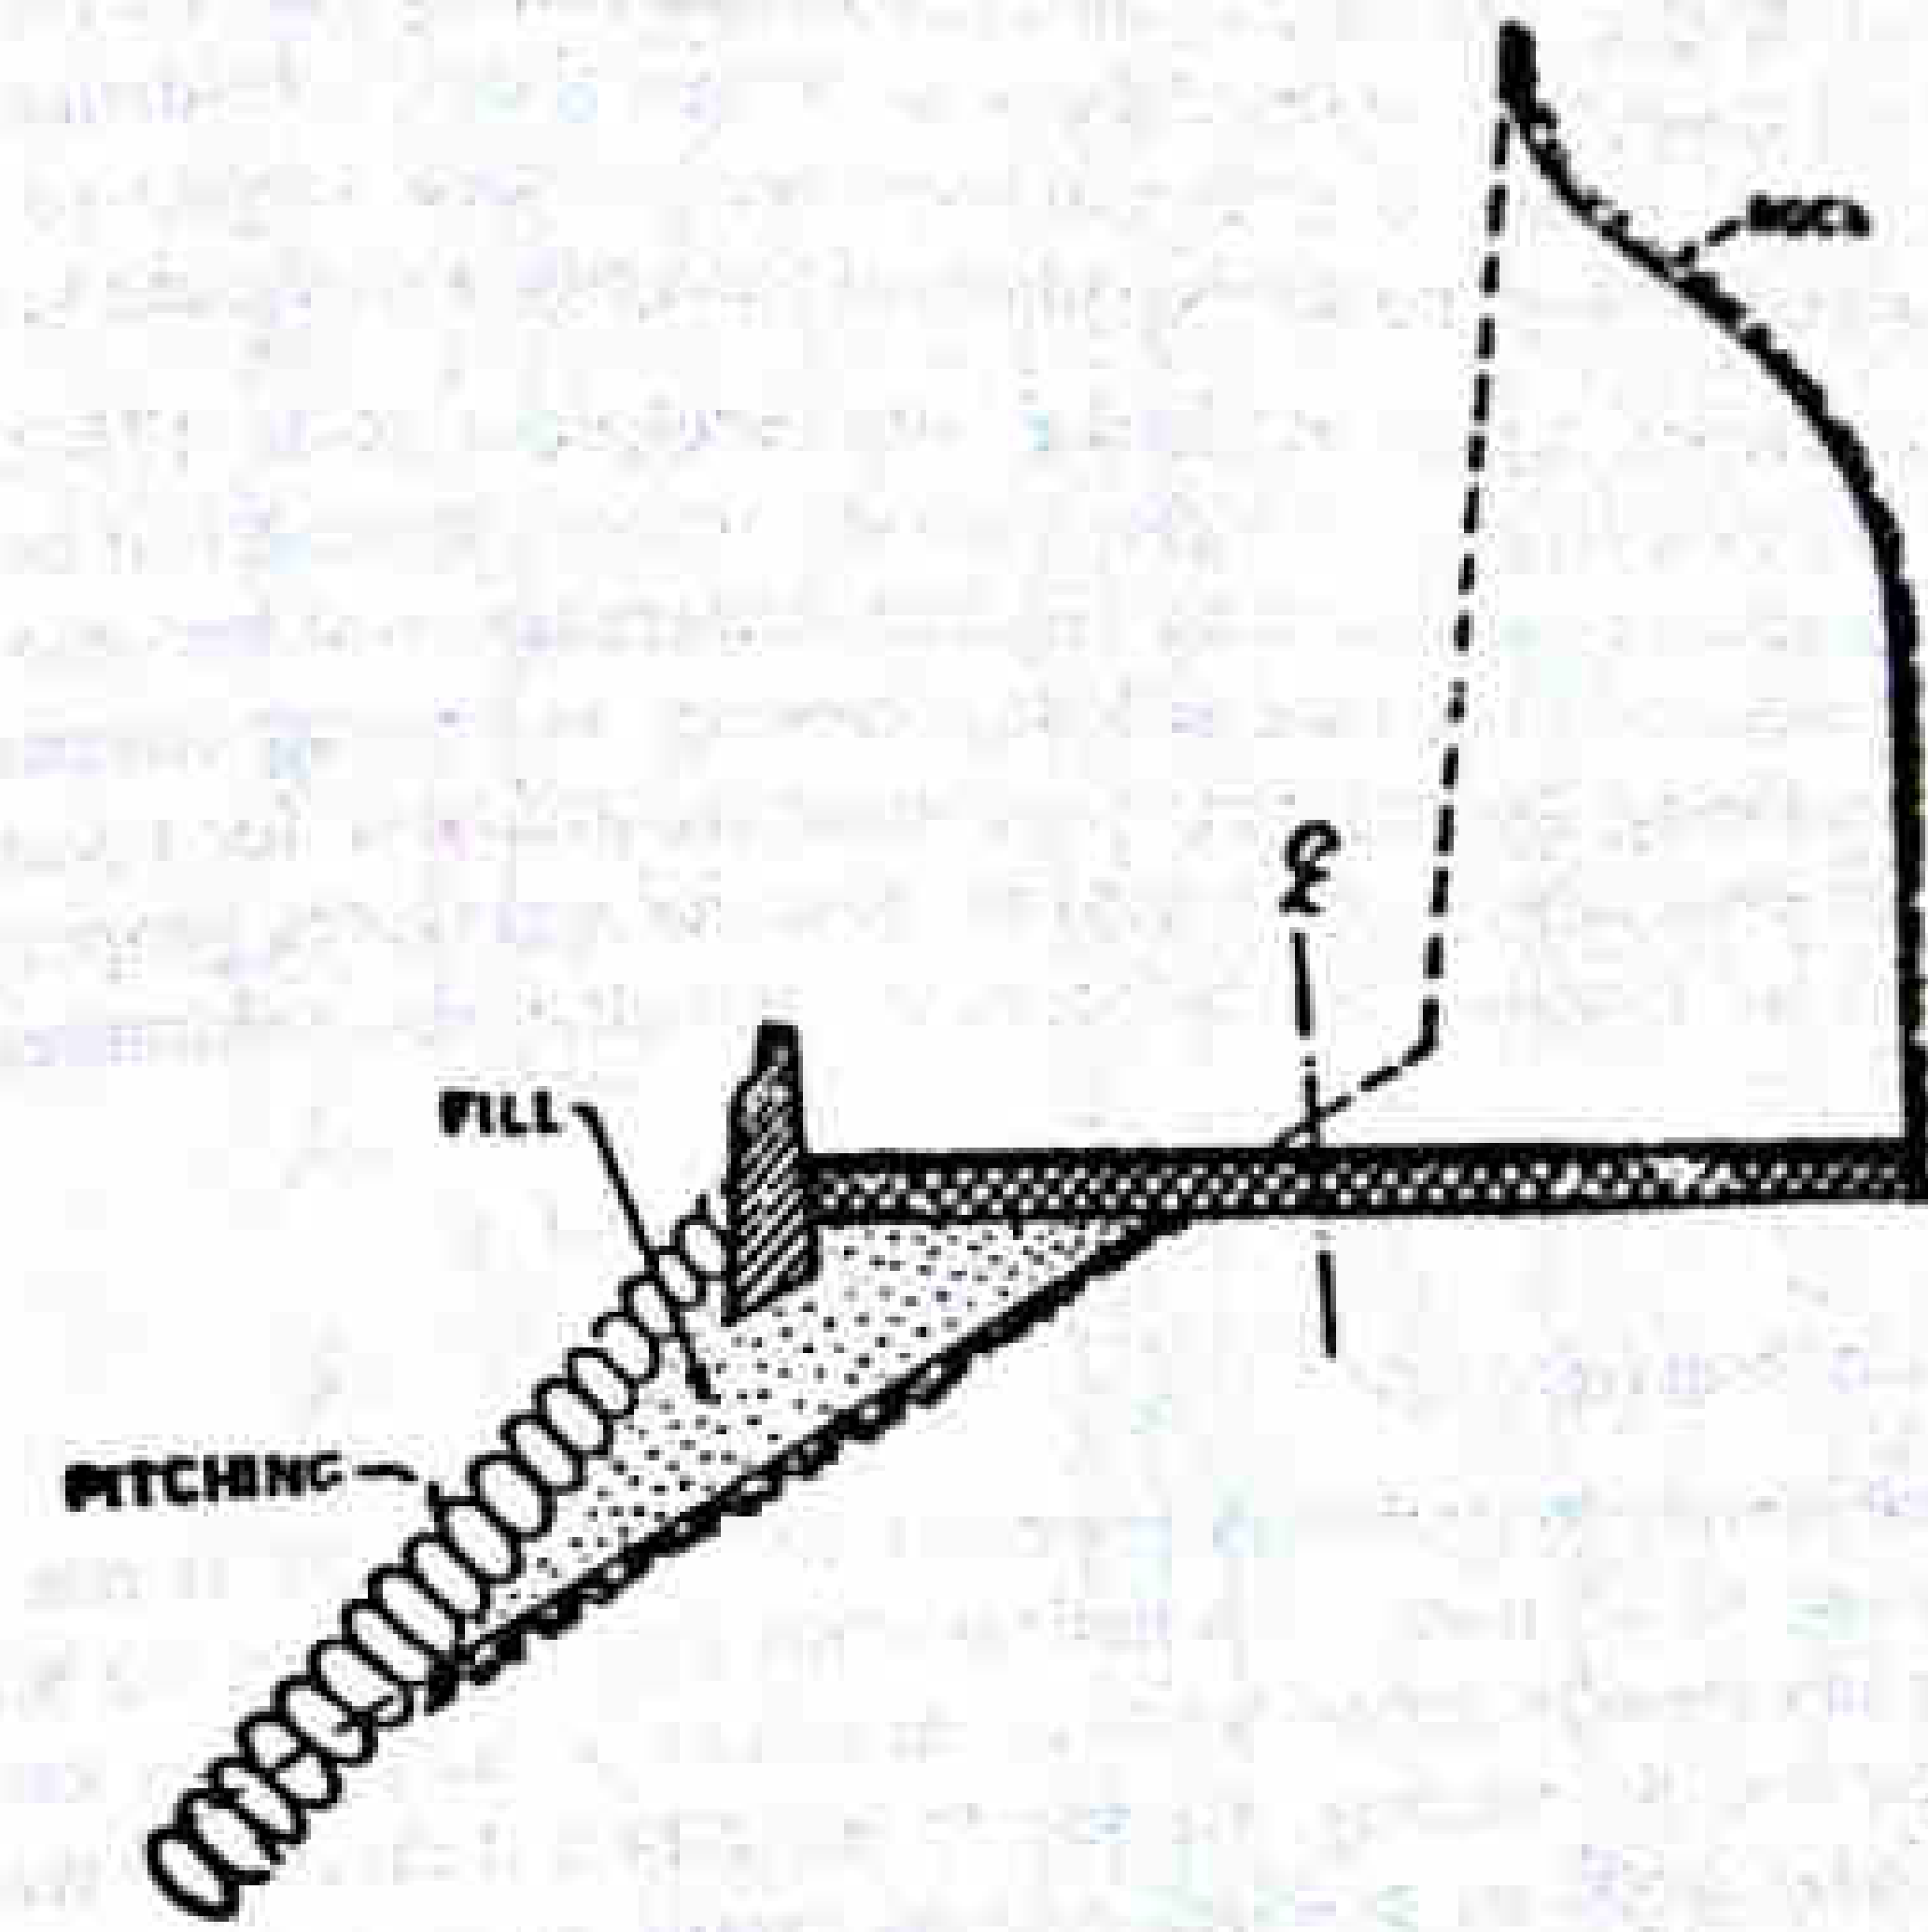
Protection of Hill-slope by Stone Pitching
